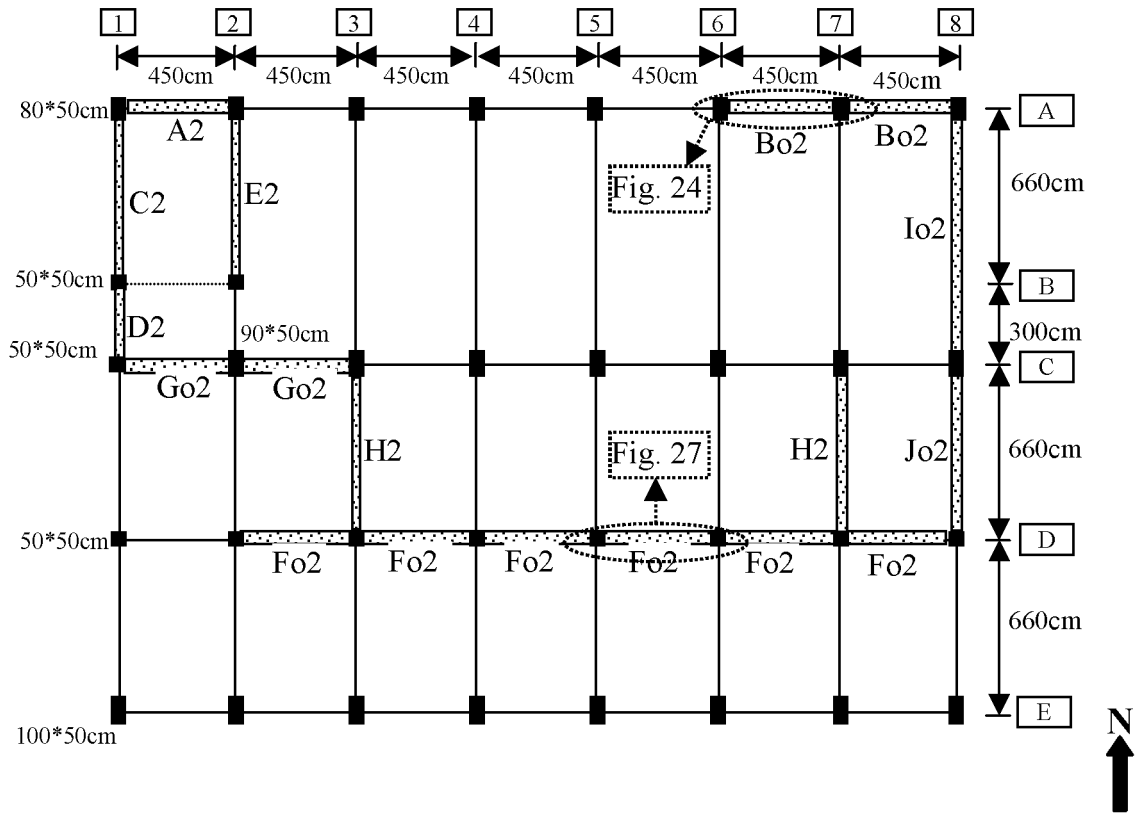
b. Plan of Ground Floor, Columns, and Infill Walls.
